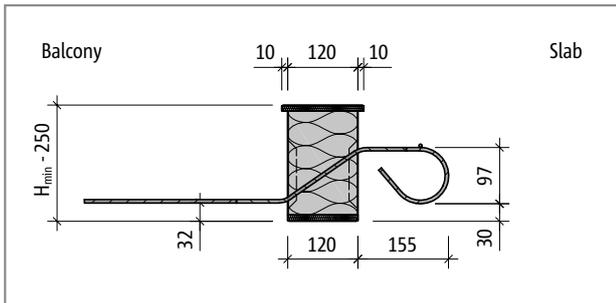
Schöck Isokorb® XT type Q-Z-V1 to Q-Z-V4: Product section
